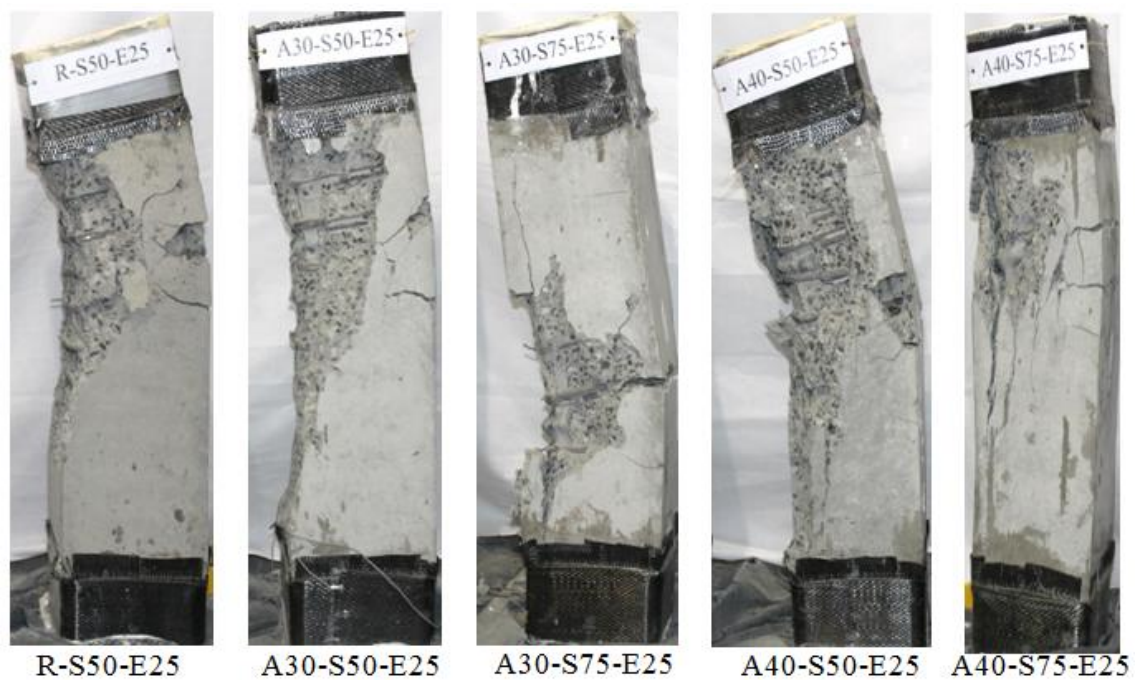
Behaviour of Specimens under 25 mm eccentric axial loads: Side view
